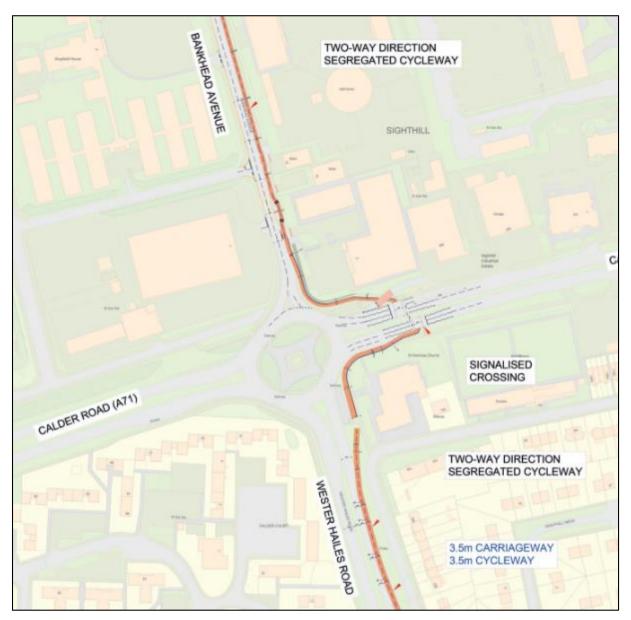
Segregated cycleway on Bankhead Avenue and new crossing of Calder Road
